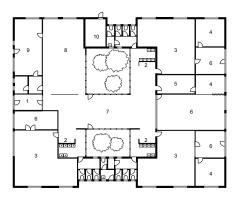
Plan drawing of Råå preschool in scale 1:600. Drawn by author based on work by Dorte Mandrup (2013).
